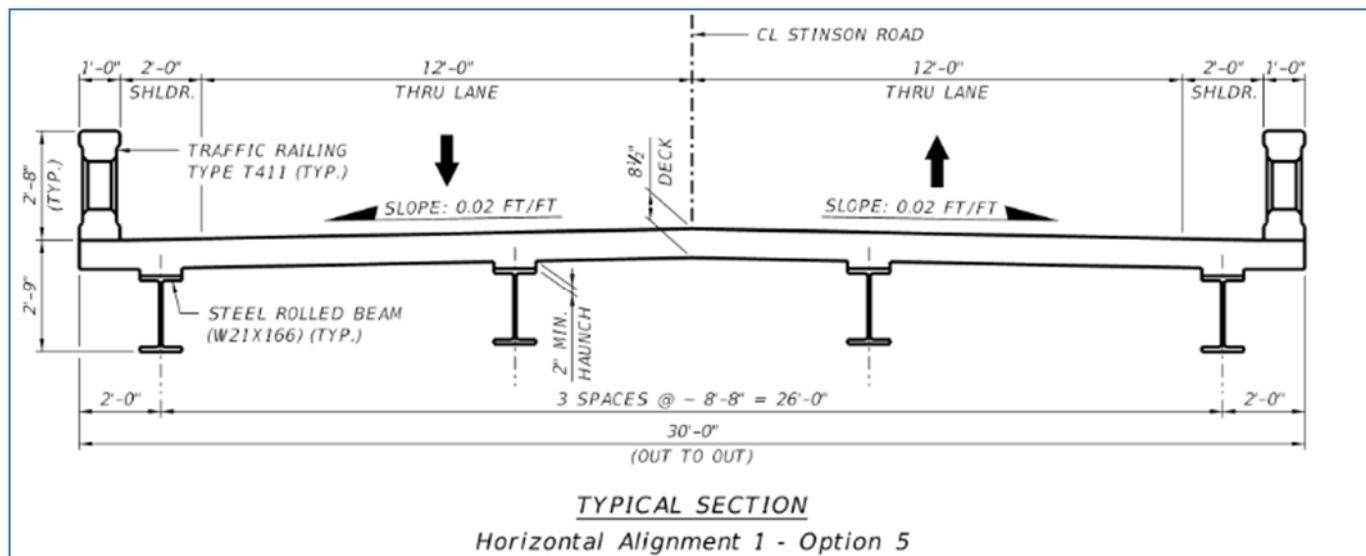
Steel Rolled Beams (W21X166) Typical Section
